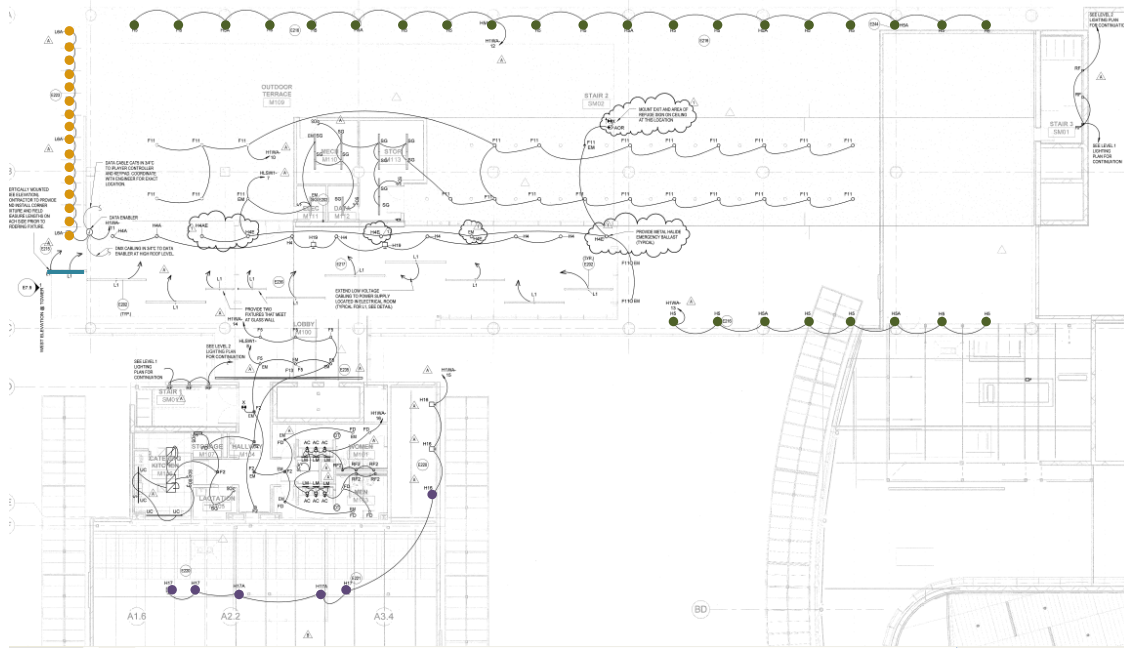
Low Roof and Mezzanine Area A Lighting Plan (NTS)
